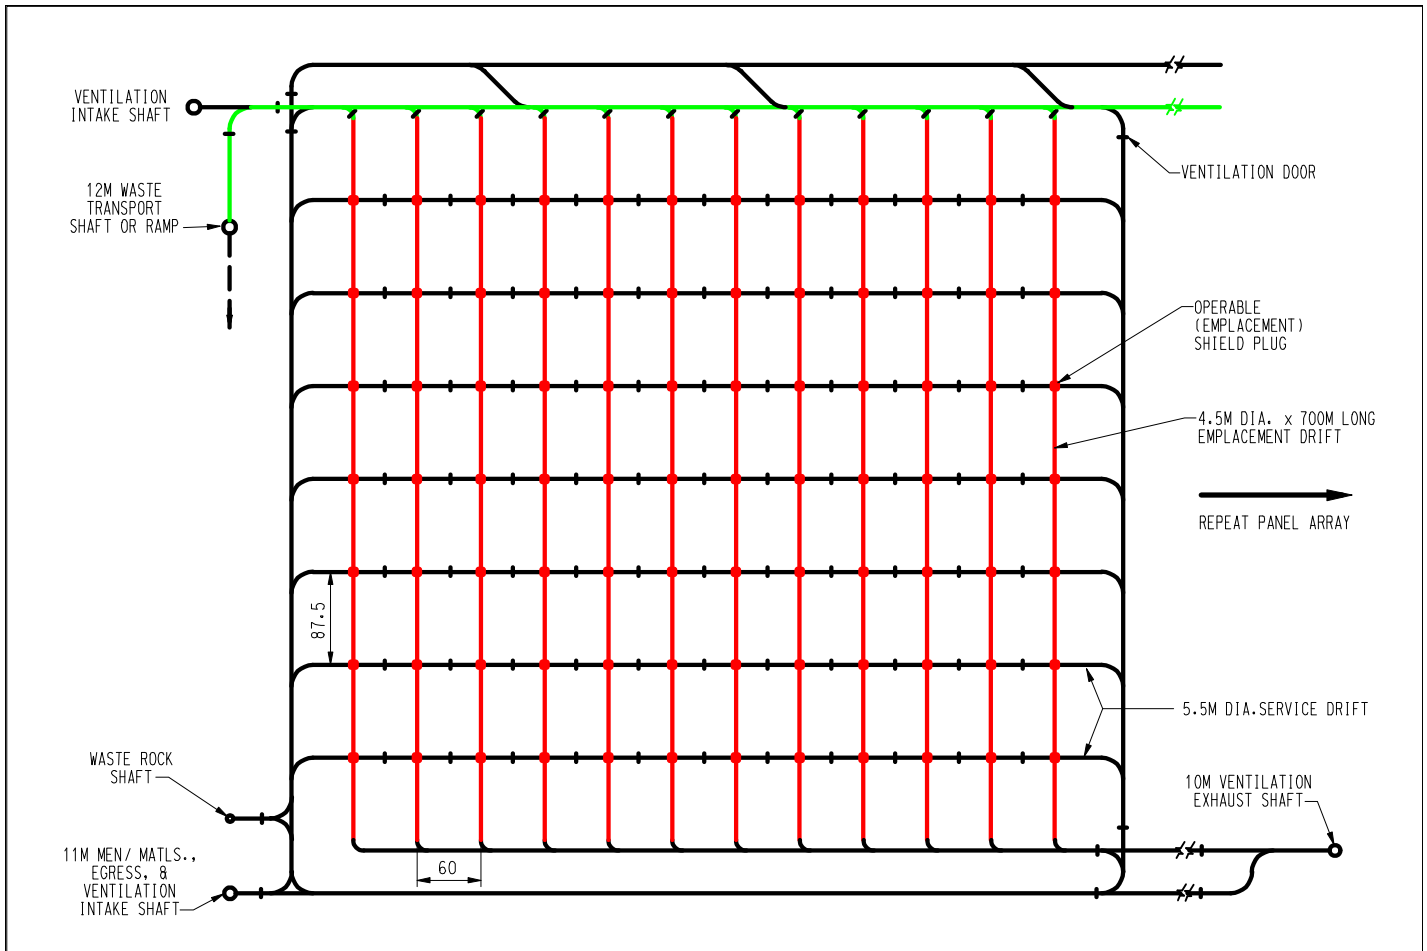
Shale Unbackfilled Open Concept Repository Panel Layout
